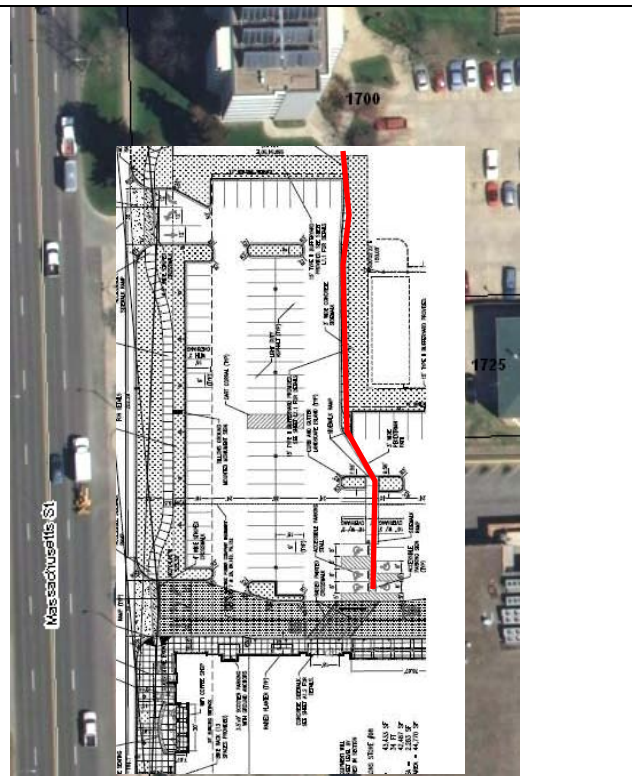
Proposed cut-through route including a concrete walkway in bufferyard, crossing an access aisle and a raised walkway between parked cars to access the entry.
